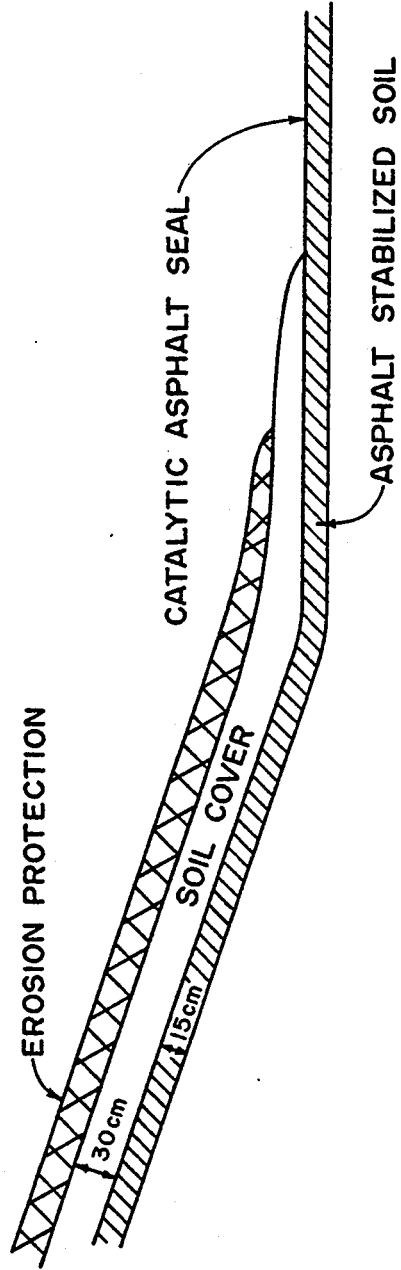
SCHEMATIC CROSS-SECTION OF SEALED SOIL ASPHALT LINER
